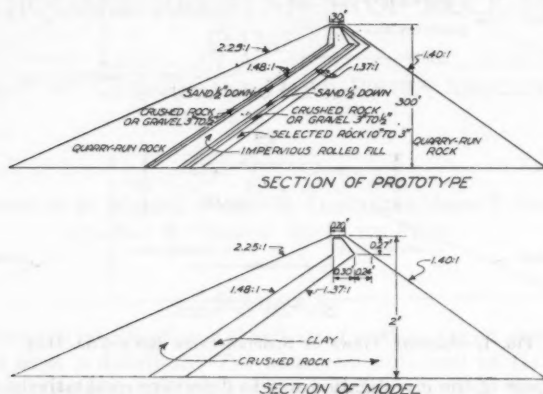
SECTION VIEWS OF CENTER-CORE ROCK-FILL DAM
